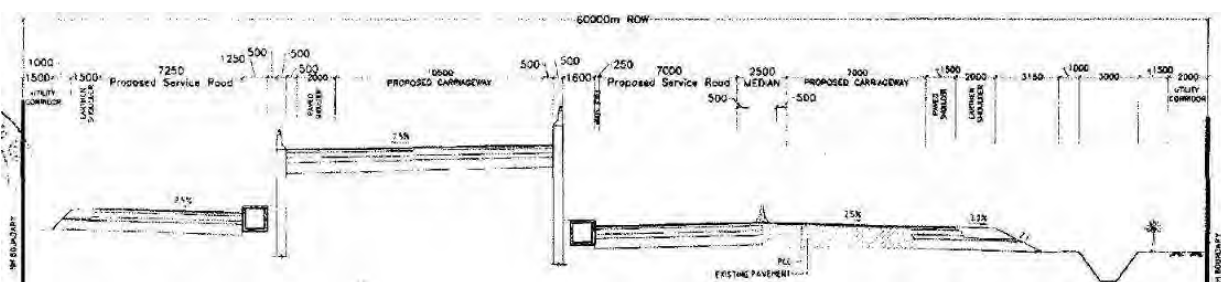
Typical Cross Section for 3 lane flyover left side widening with service road (TCS-18A)
